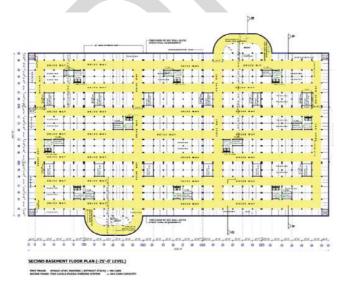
Second underground floor plan © Department of Urban Planning, U.T. Chandigarh
